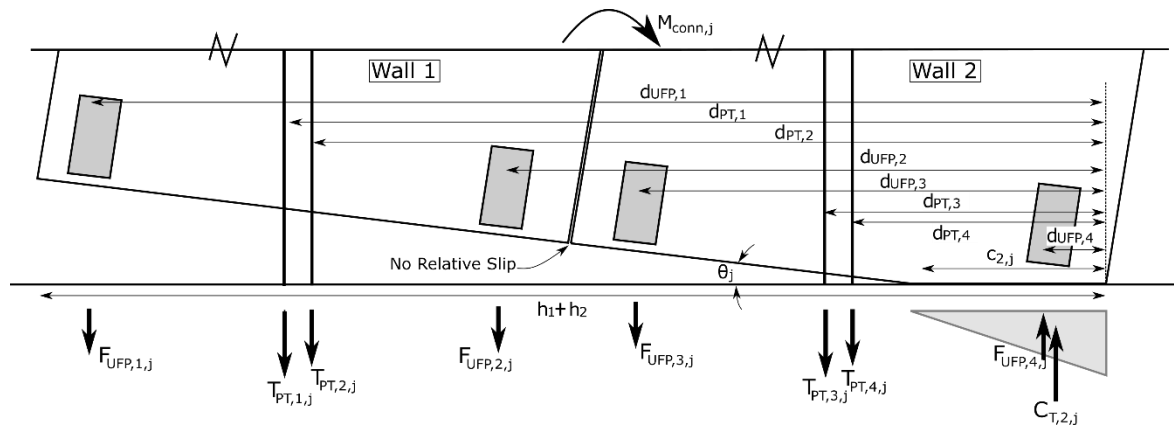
Section analysis of post-tensioned double wall with UFPs and STS connectors under kinematic single wall behaviour mode
